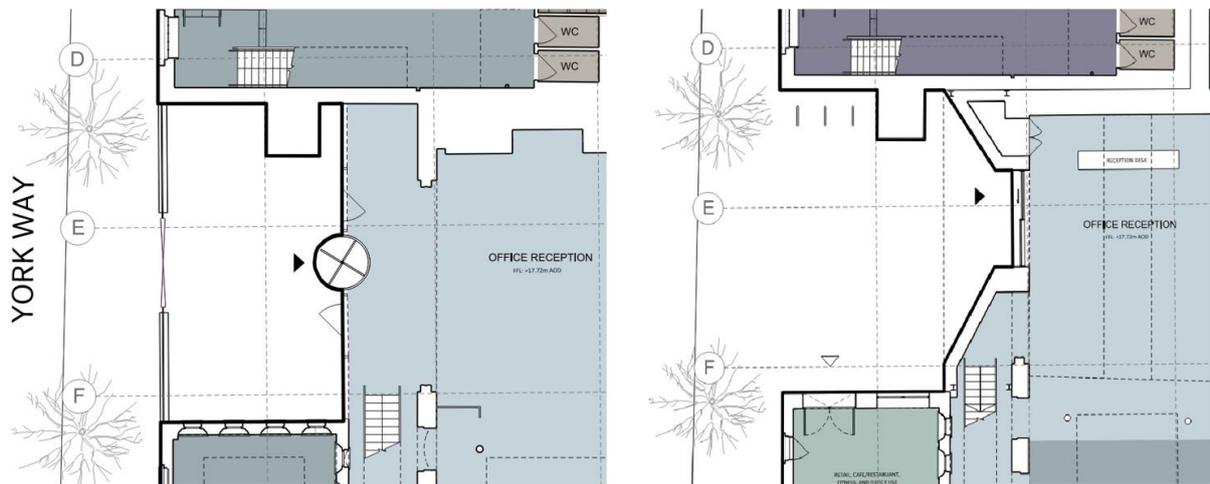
Existing and proposed plans - Entrance to Jahn Court adjoining 34b York Way
